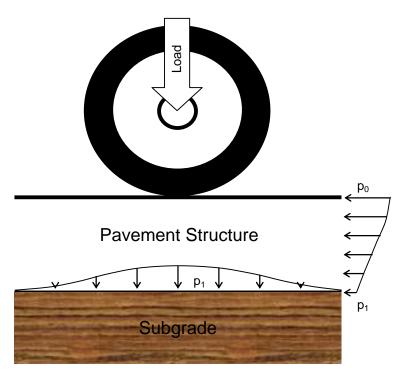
The Spread of a Wheel Load through a Pavement Structure
